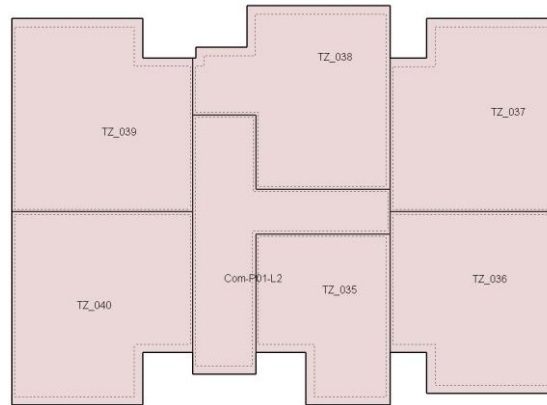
Thermal zone definition on floor 1 (4E L5 building of the Stepa Stepanovic neighborhood)
